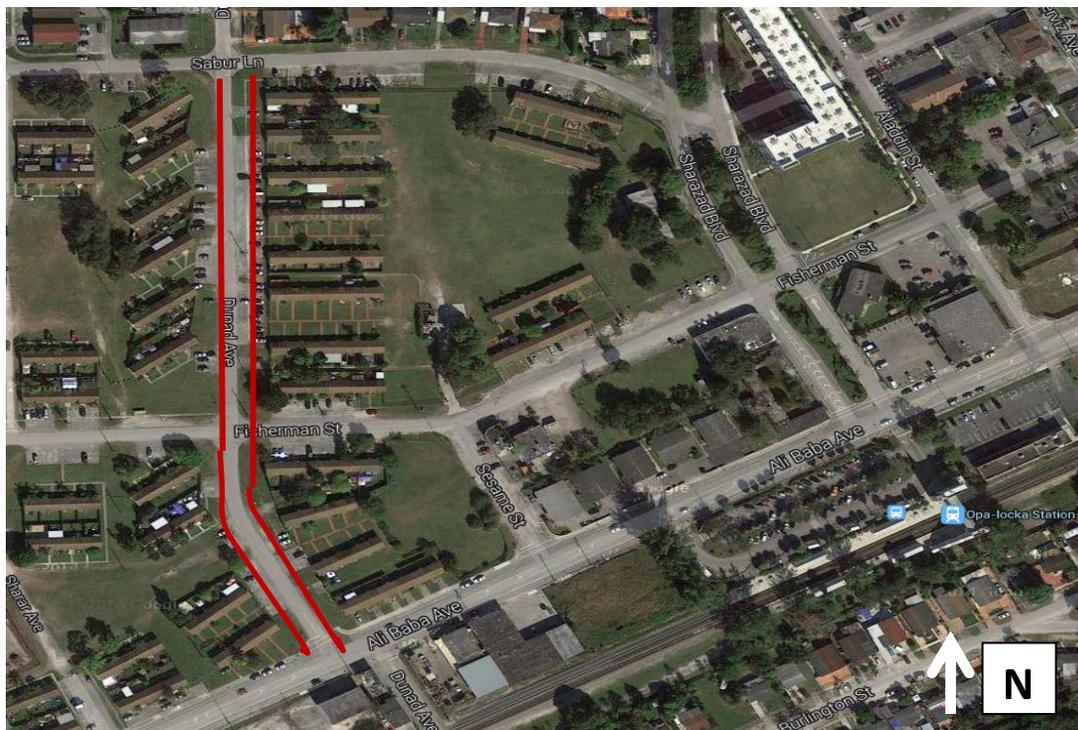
Dunad Ave Sidewalks, North (OPA3)-Construct sidewalks on both sides of street.
